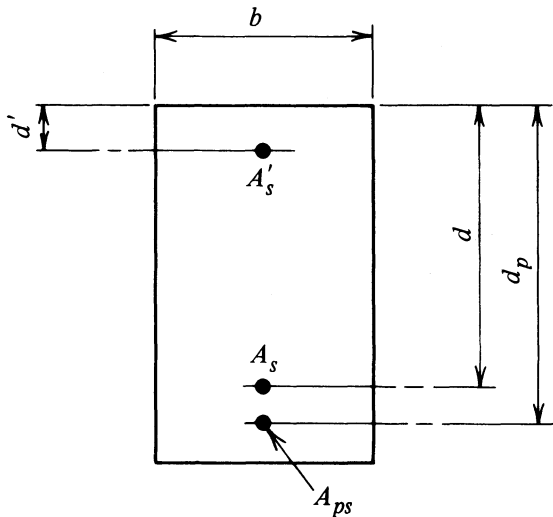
Cross section of a rectangular flexural member having bonded nonprestressed tension and compression reinforcement in addition to bonded prestressed tension reinforcement.
